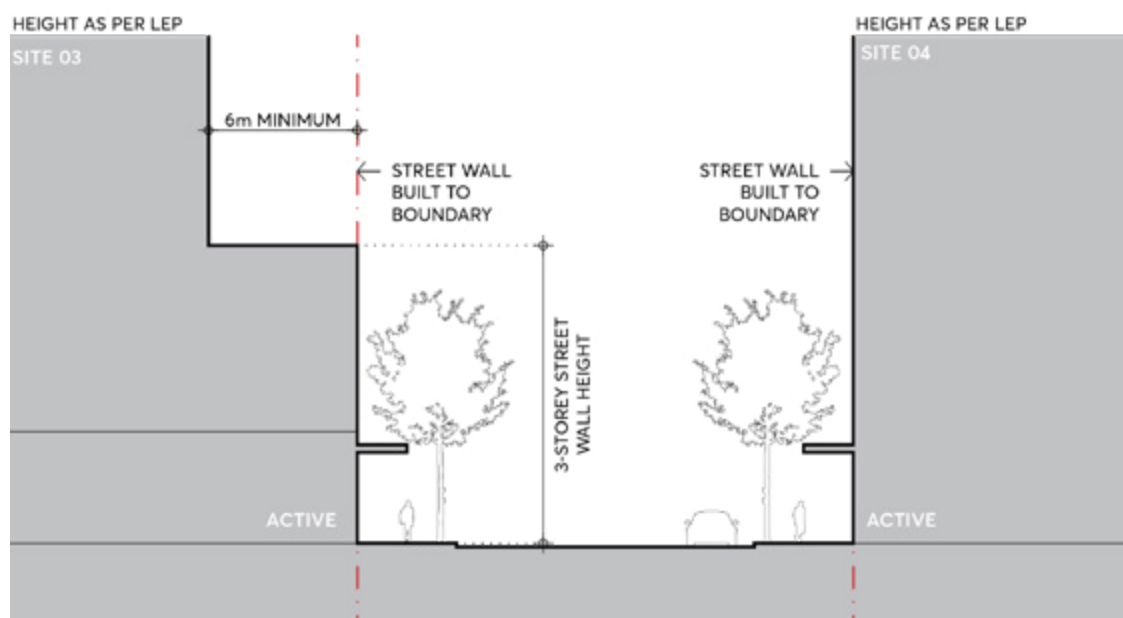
Marion Street (Section A) Setbacks and Street Wall Height
